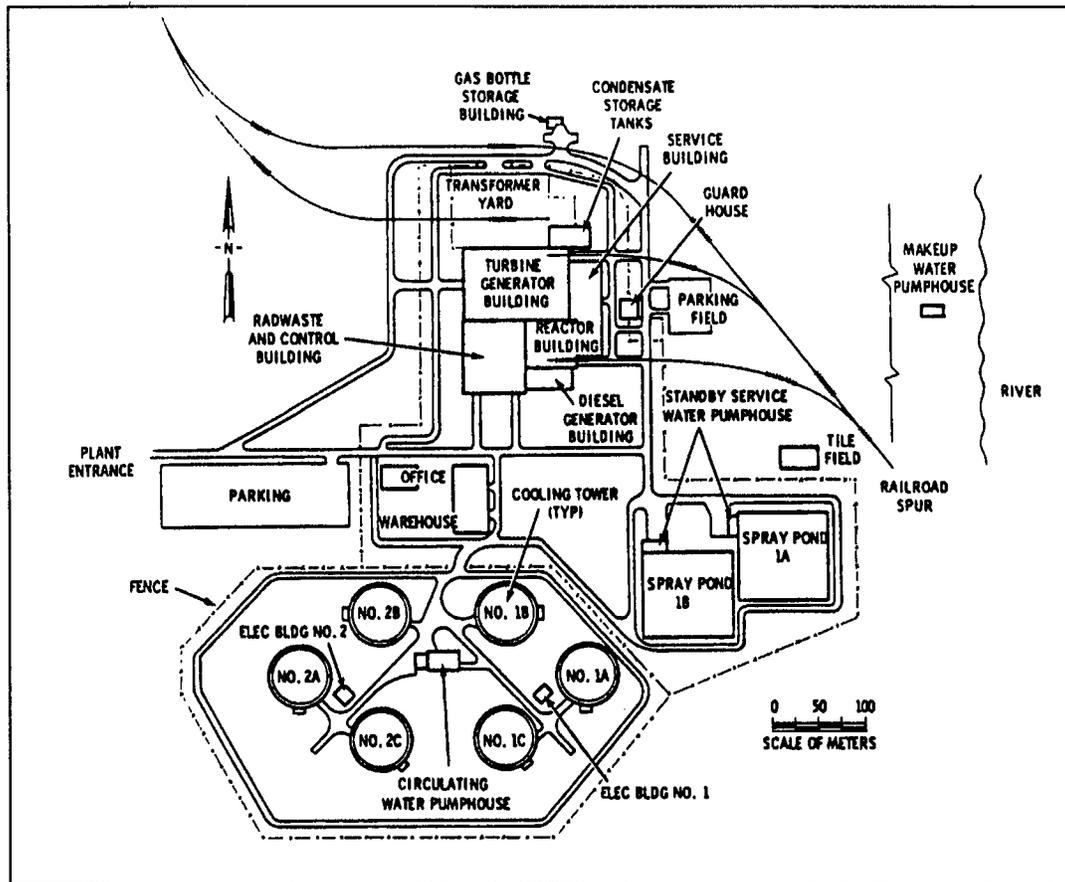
Site layout on a typical boiling-water reactor power plant. Adapted from NUREG-0672.
